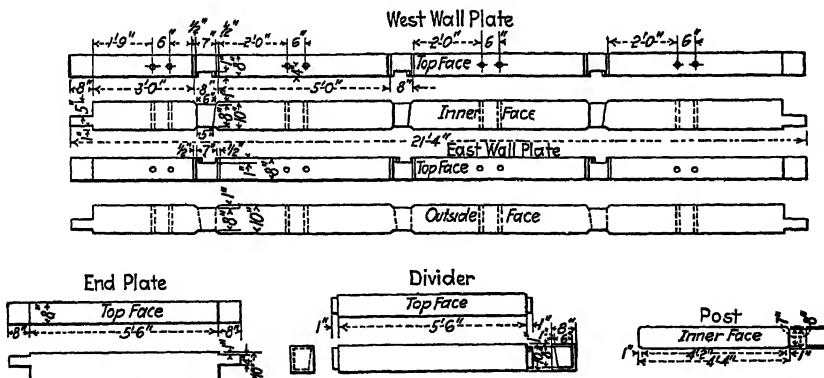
SHAFT TIMBERING AT No. 2 MINE.
